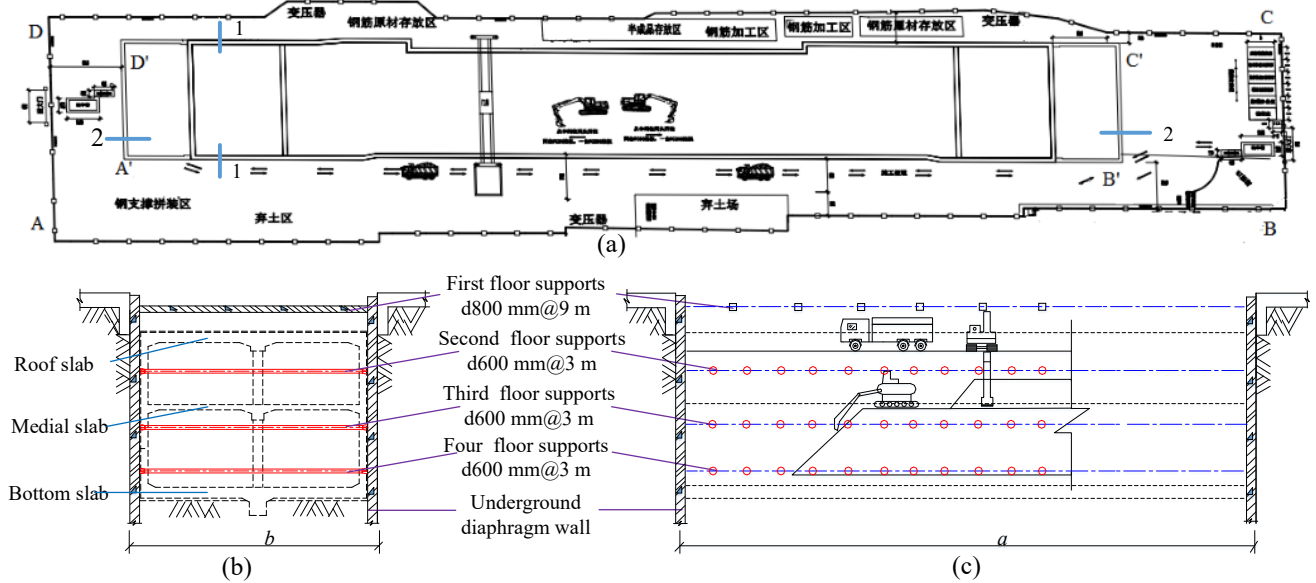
(a) Sketch of the metro station construction site, (b) 1-1 section view, (c) 2-2 section view
